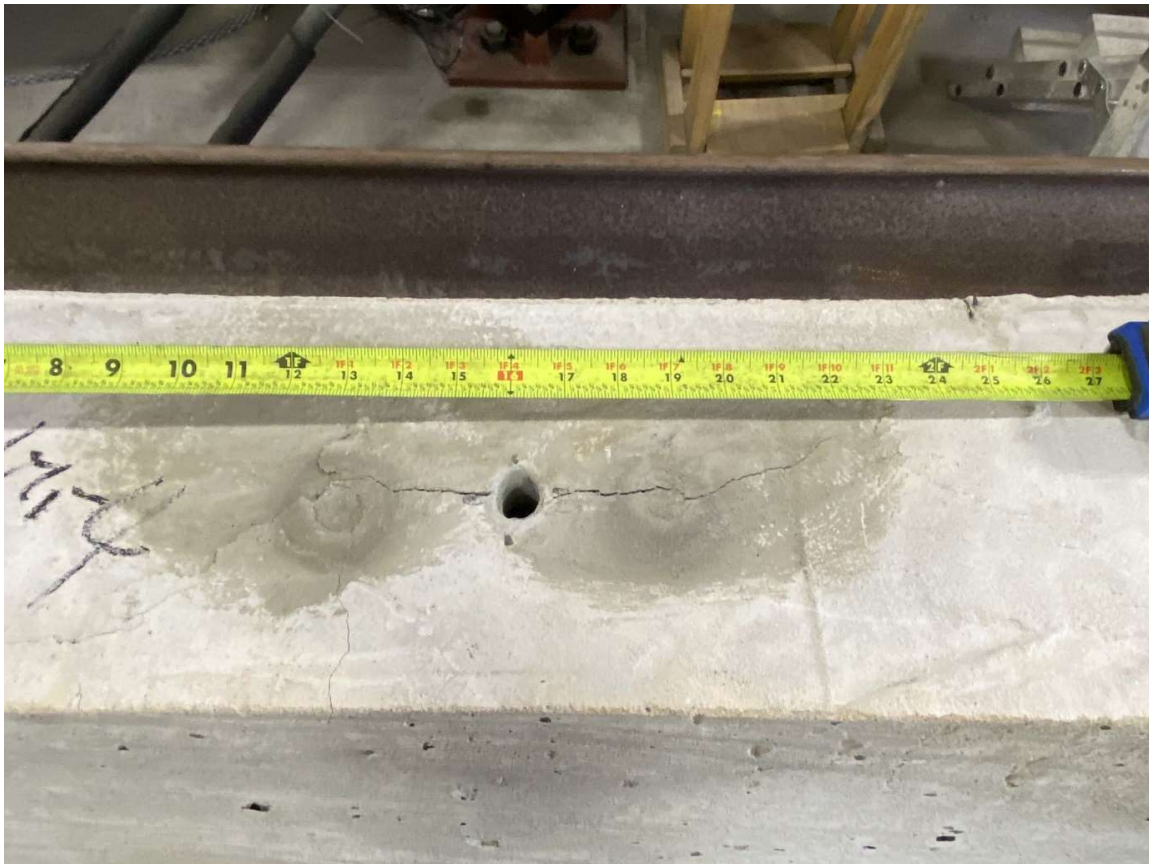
P-G1-4 specimen concrete after anchor breakout
